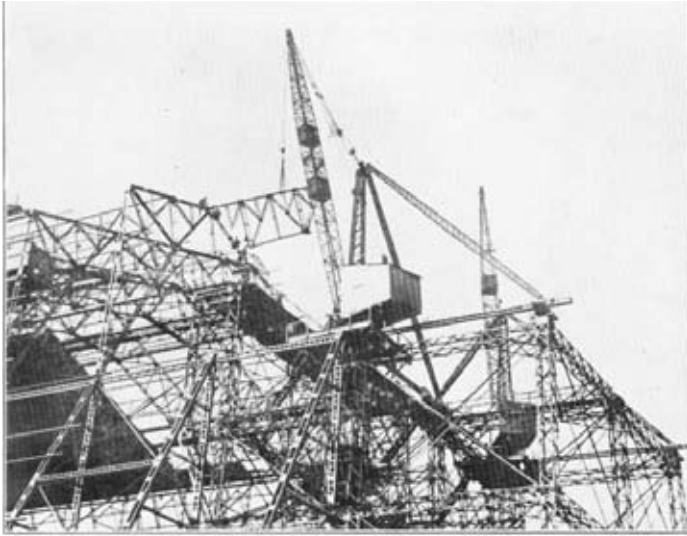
Shed, showing Sections of Roof being hoisted into position.
